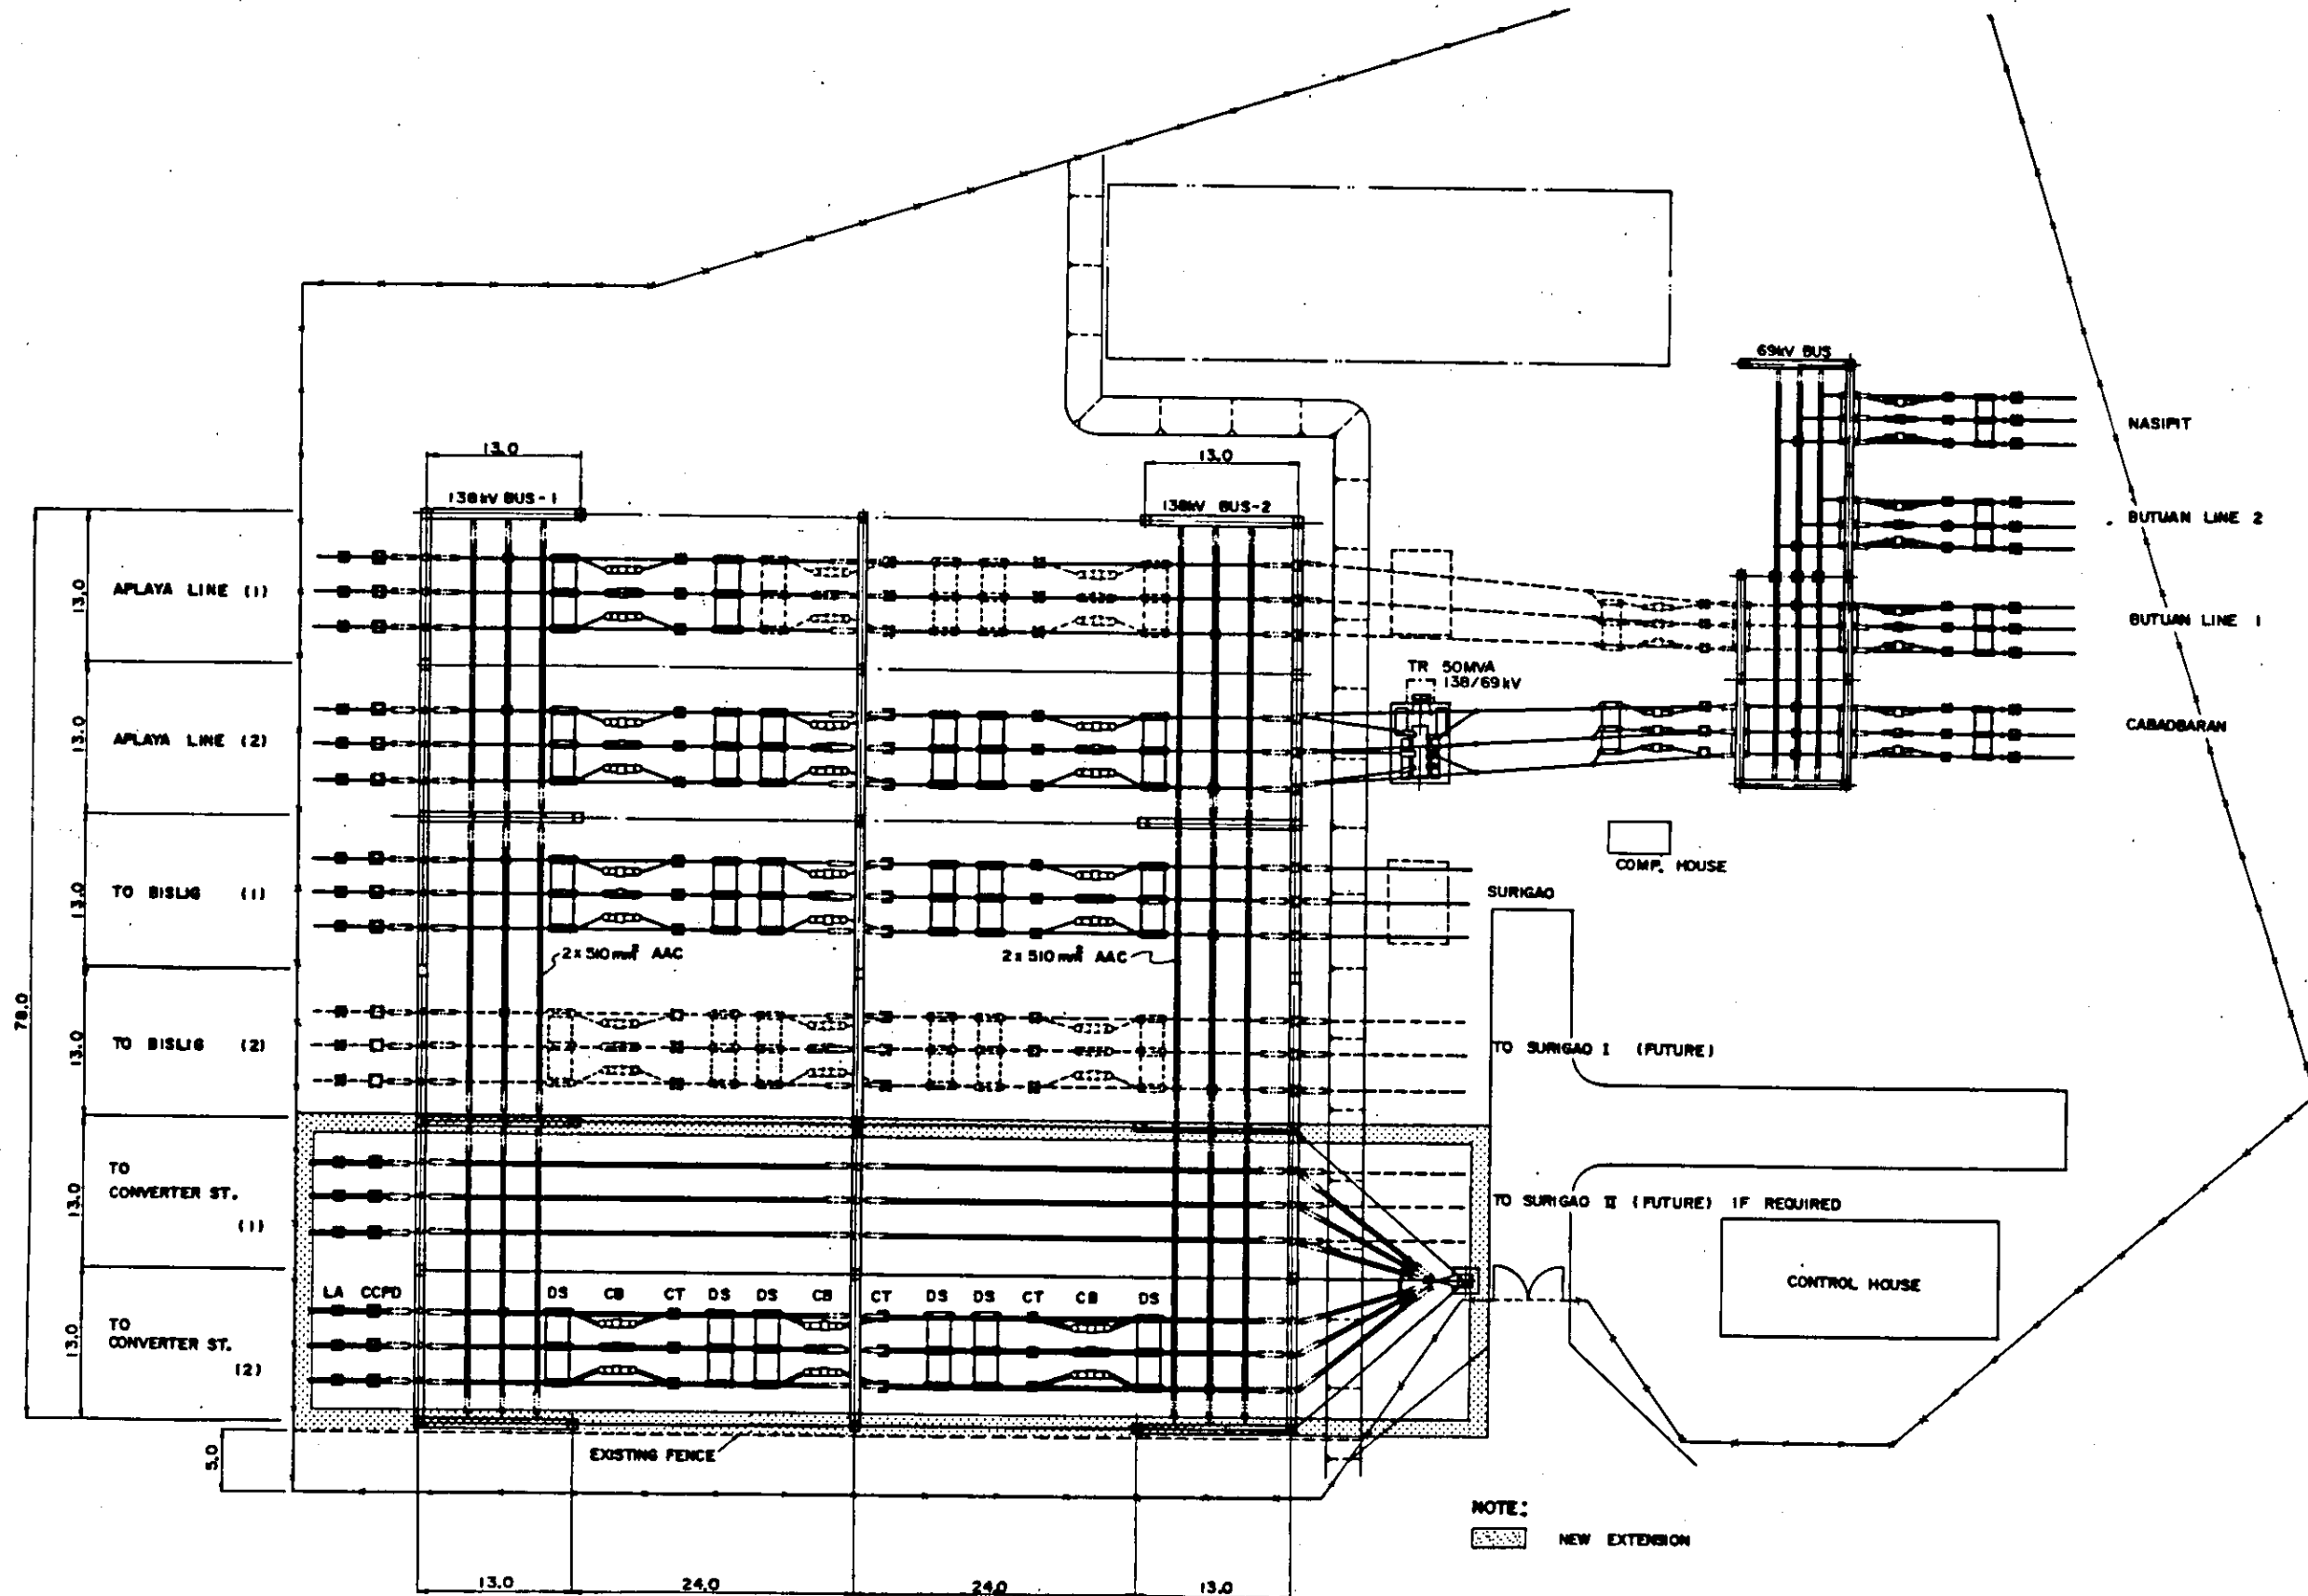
LAYOUT OF BUTUAN SUBSTATION (TENTATIVE)
